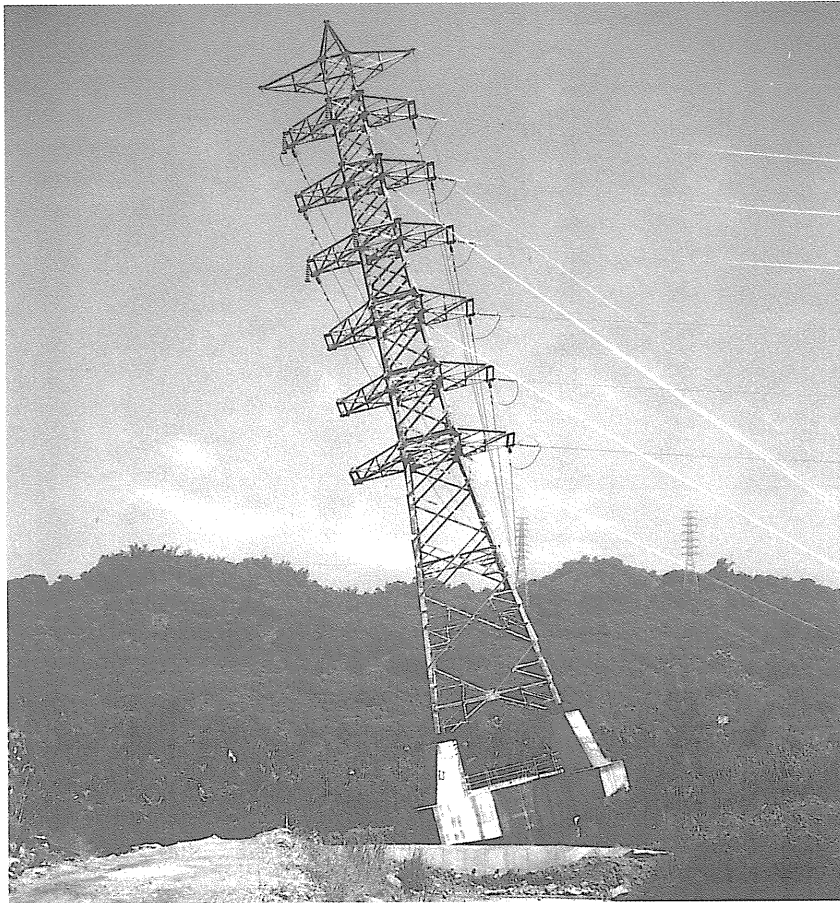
Leaning transmission tower. (Photo: Tseng)
